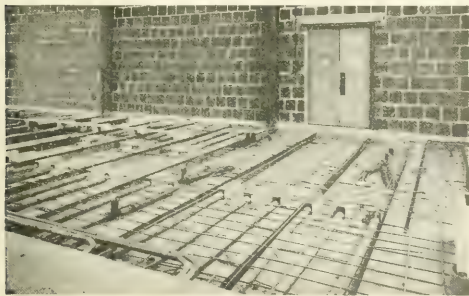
CONSTRUCTION OF FLOOR UNDER THE SWITCHBOARD
